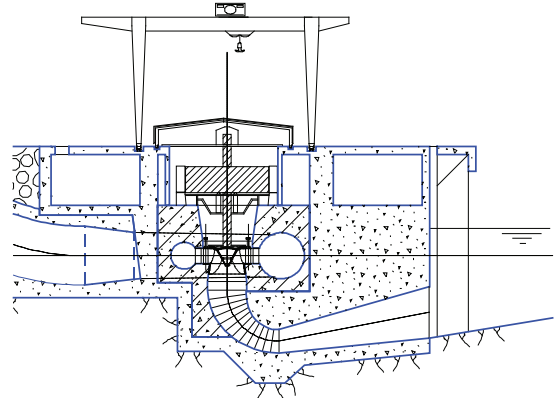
Outdoor Powerhouse – typical cross-section.
